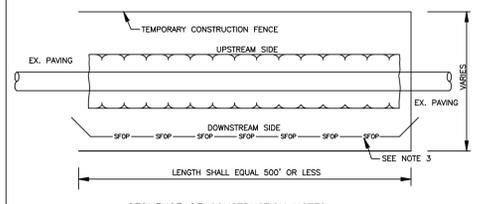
TYPICAL EROSION AND SEDIMENT CONTROL MEASURES FOR OPEN CUT TRENCH OUTSIDE EXISTING ROADWAY
